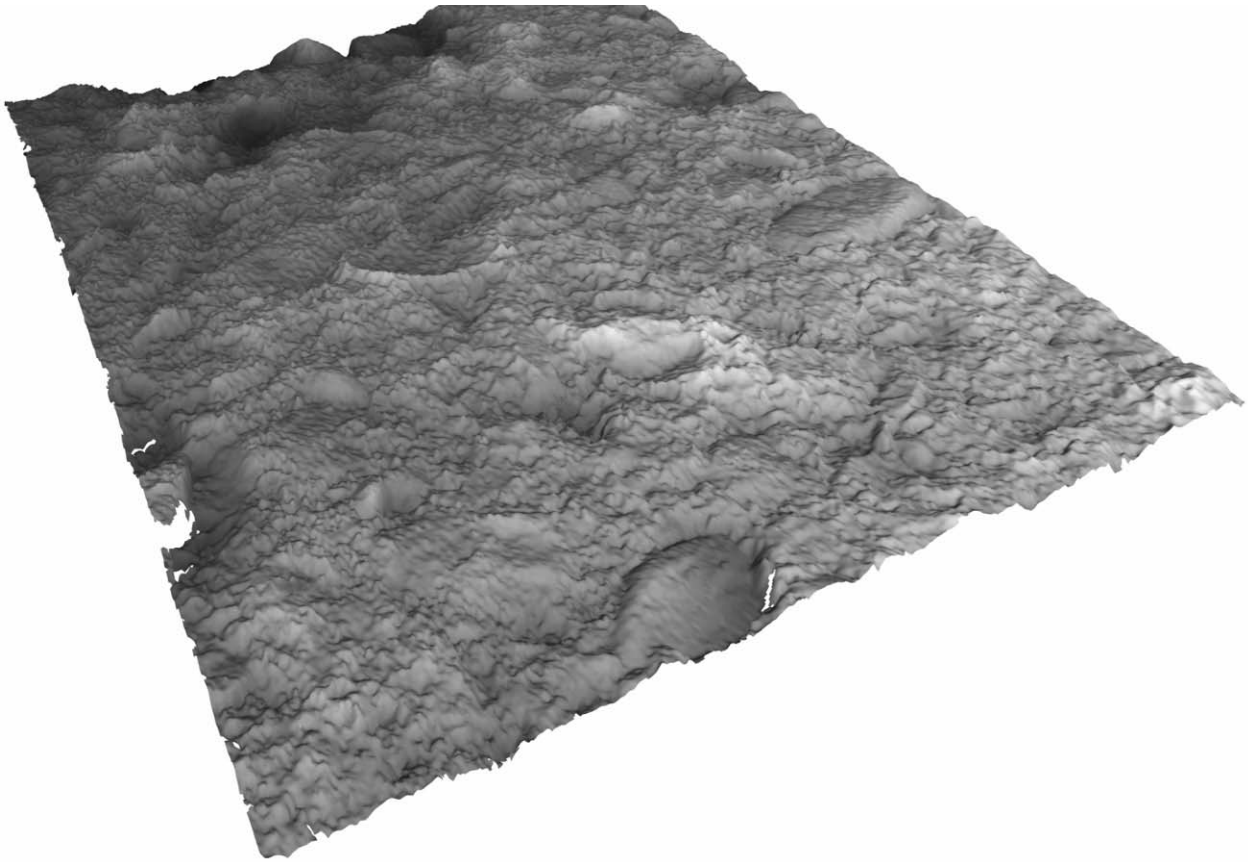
3D texture model of pavement surface for a 125 x 100 mm section.
